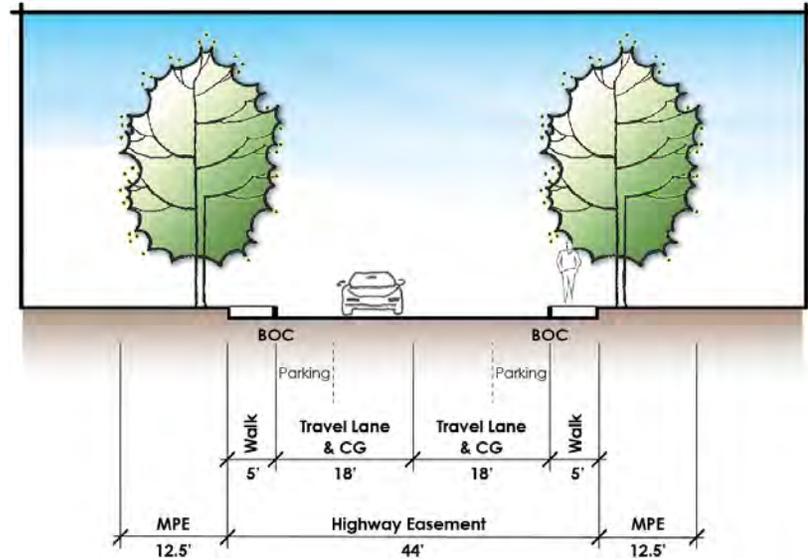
MINOR RESIDENTIAL STREET (WITH ATTACHED SIDEWALK)
